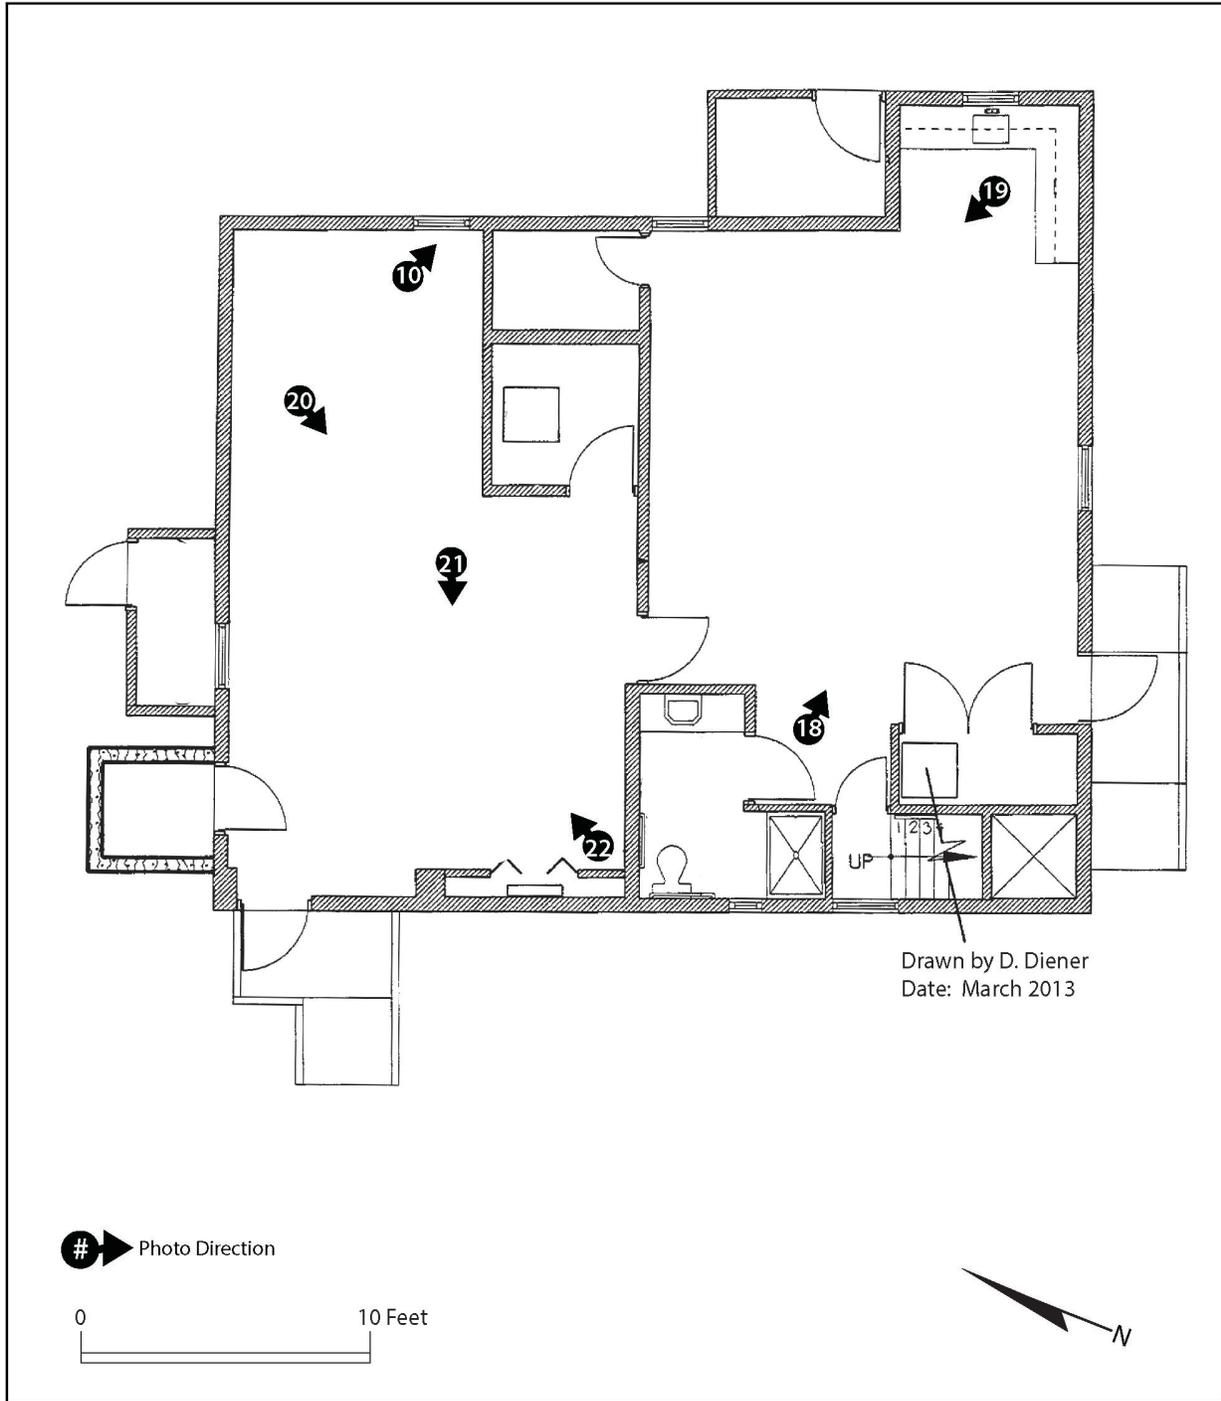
Ground Floor Photograph Key for HABS NO. FL-8-583-B.
